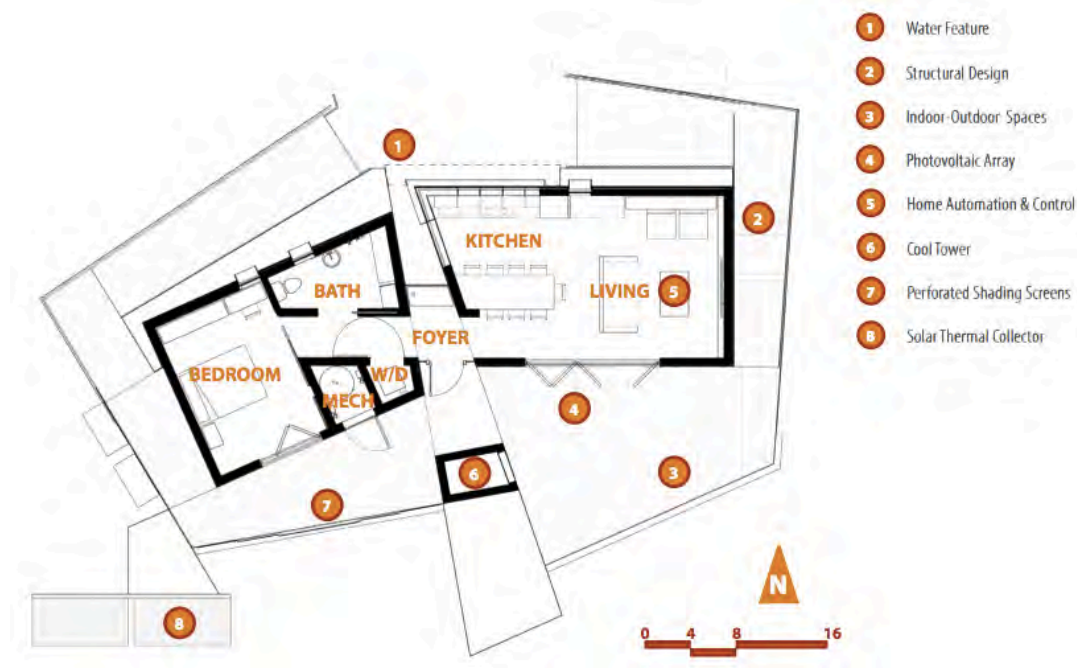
Floor Plan of DesertSol [Image by UNLV]
